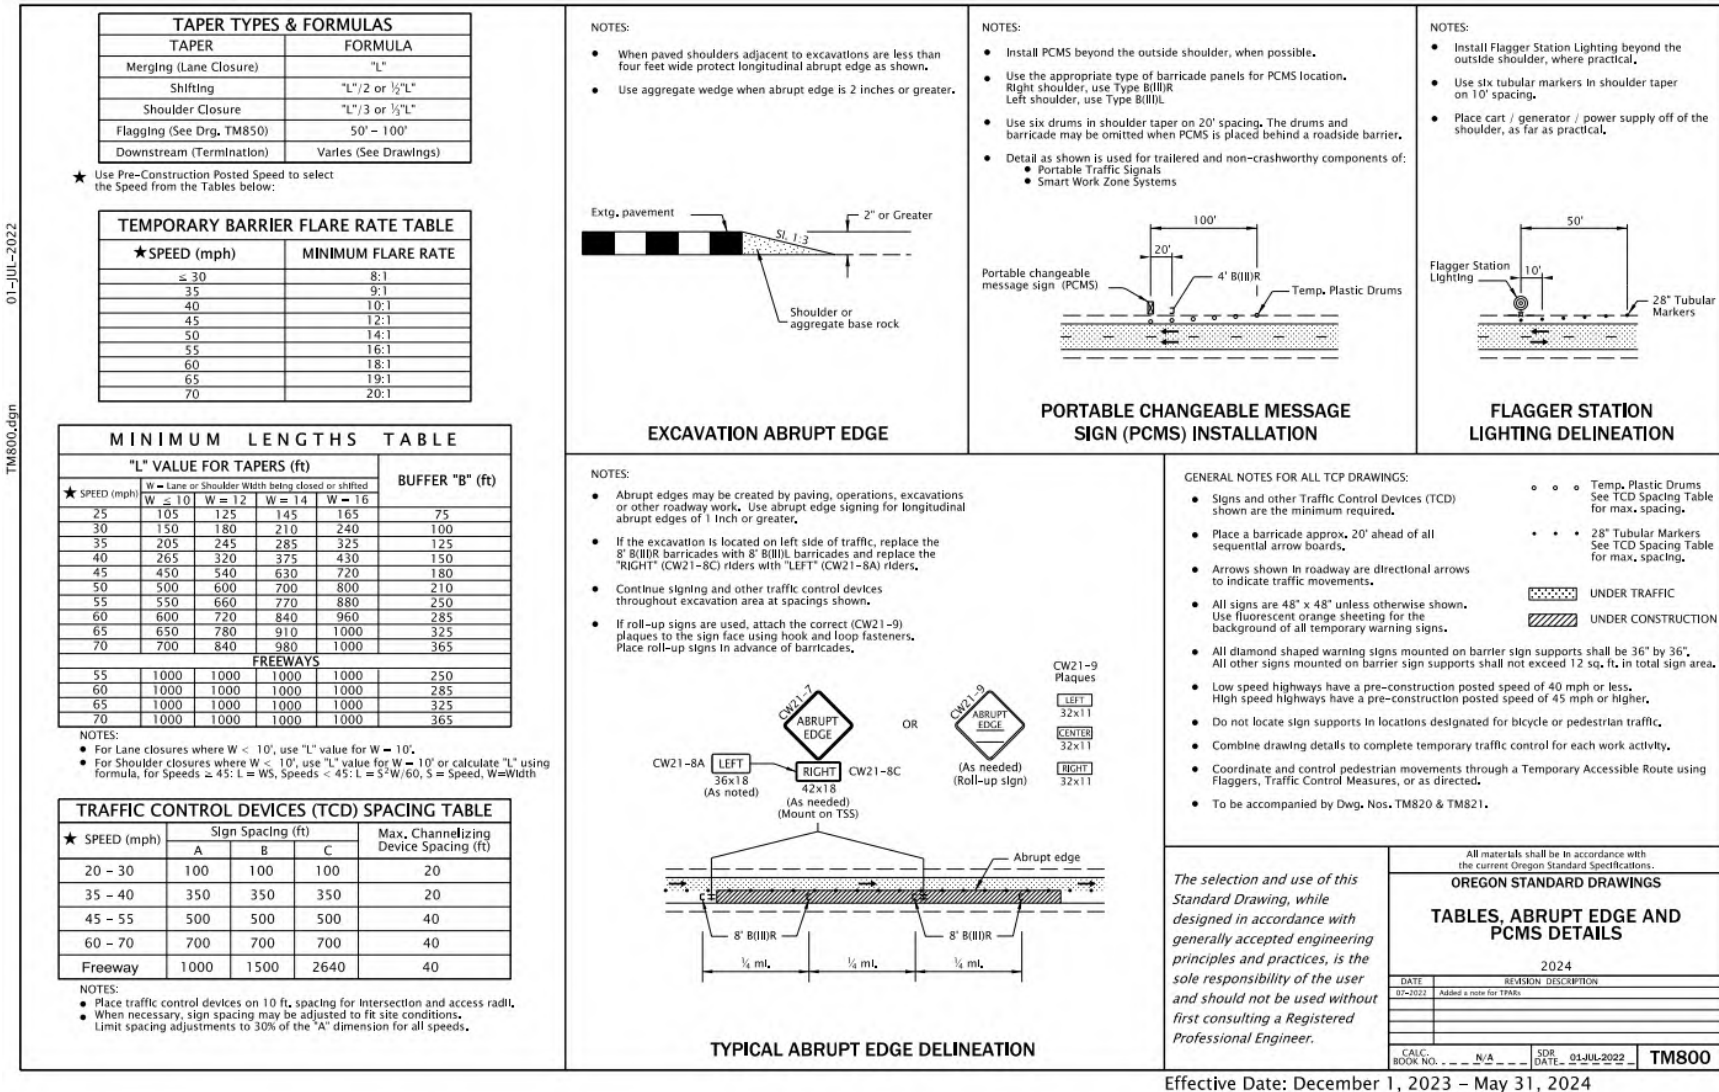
Example ODOT Traffic Control Plan. Tables, Abrupt Edge and PCMS Details.
